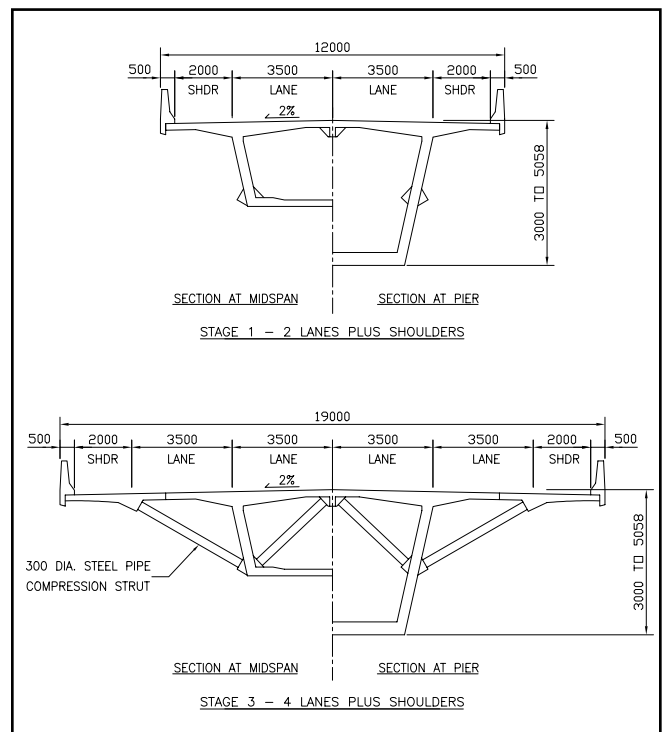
Proposed cross section widening at midspan and pier for Confederation Bridge.
